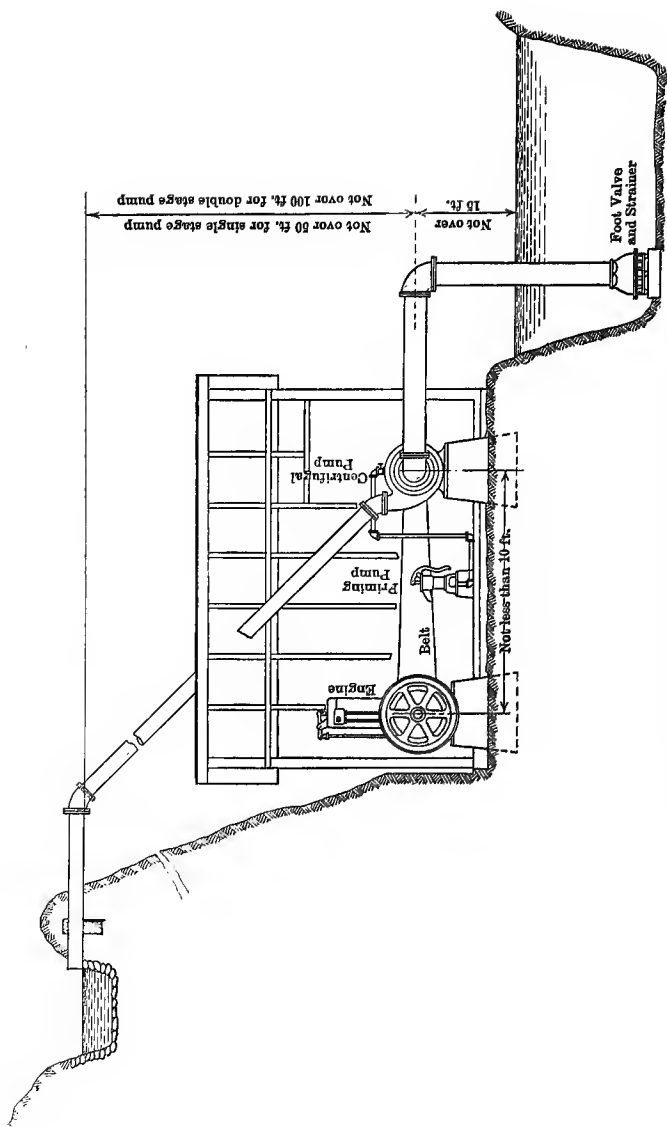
A small, cheaply built plant of type frequently installed for pumping from ditch on to higher bench land. See page 108.
